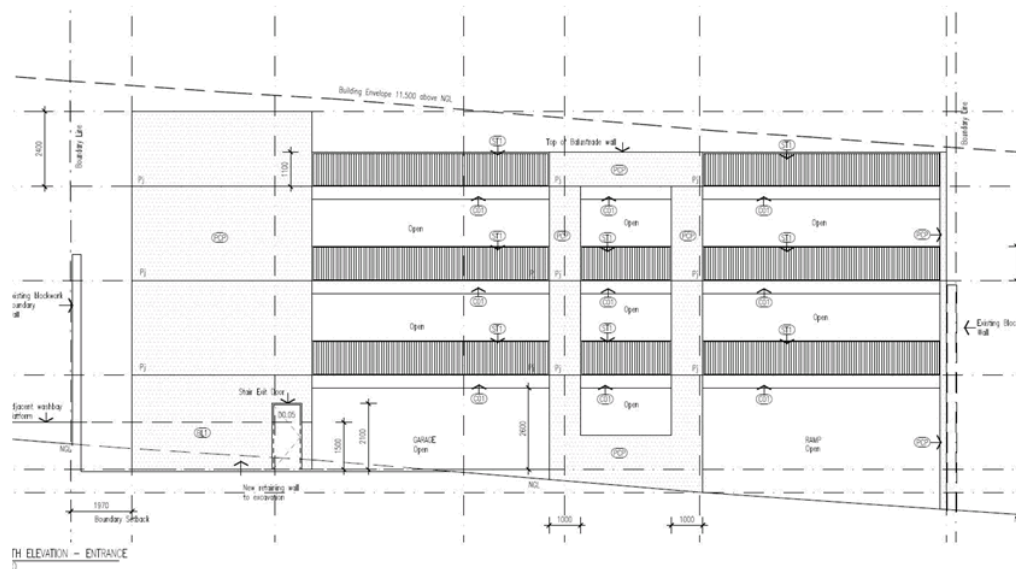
Proposed building entry elevation (source: Preston Lane Architects)
